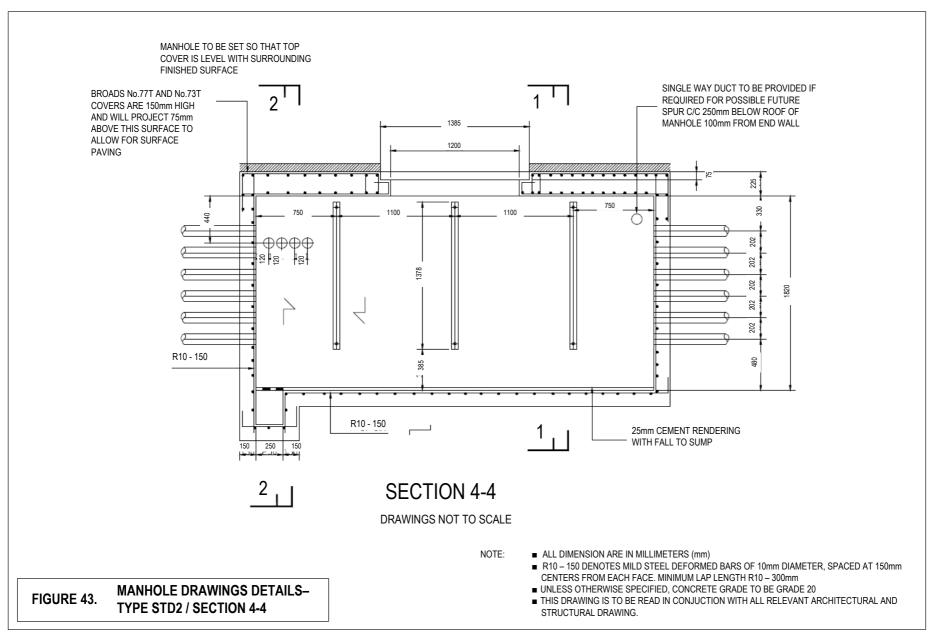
Manhole drawings details - Type STD2 / section 4-4
